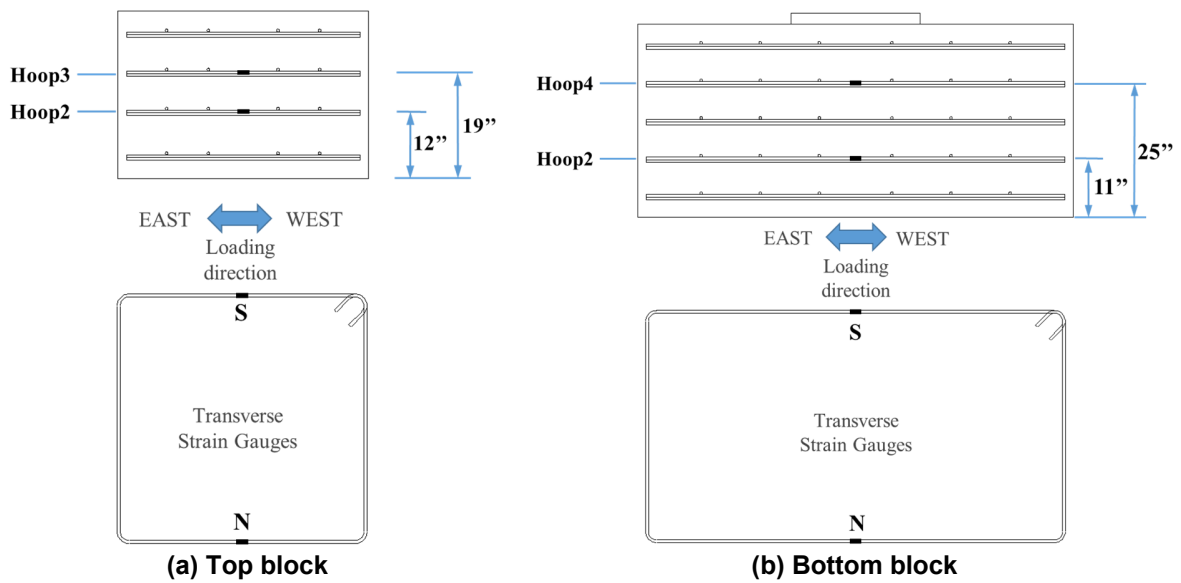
Notation of loading direction and layout of instrumented transverse bars.
